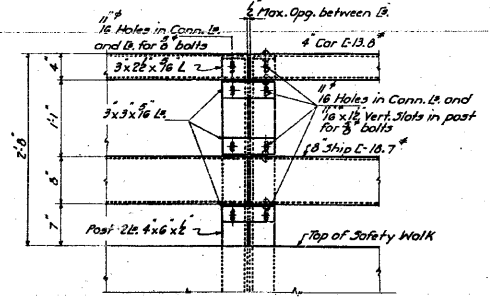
DETAIL A CONNECTION AT INTERMEDIATE DIAPHRAGMS
